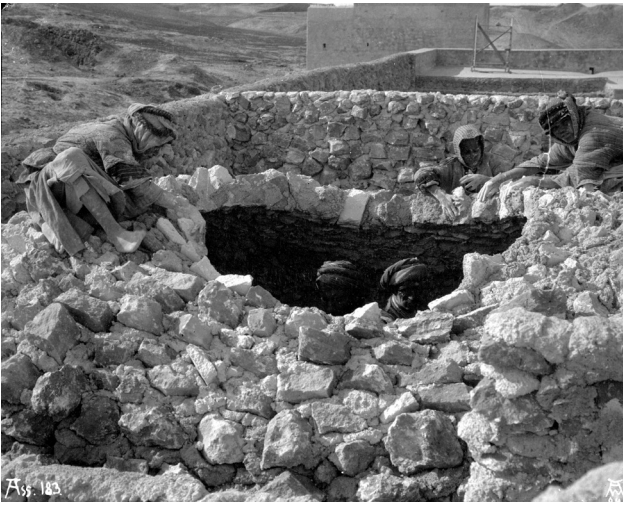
Building the roof of the blacksmith workshop in the west wing on 15 April 1904. Ass Ph 183 (© SMB, VAM, DOG; photo by Walter Andrae).
